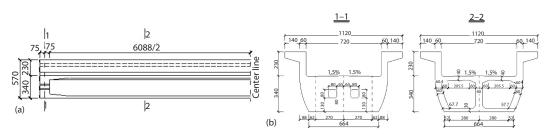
Lay-out of the bridge [cm]; (a) lay-out of the longitudinal section, (b) lay-out of the cross-section
